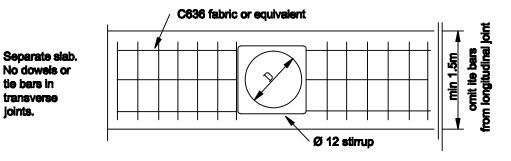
JOINT ADJACENT TO MANHOLE SLAB
